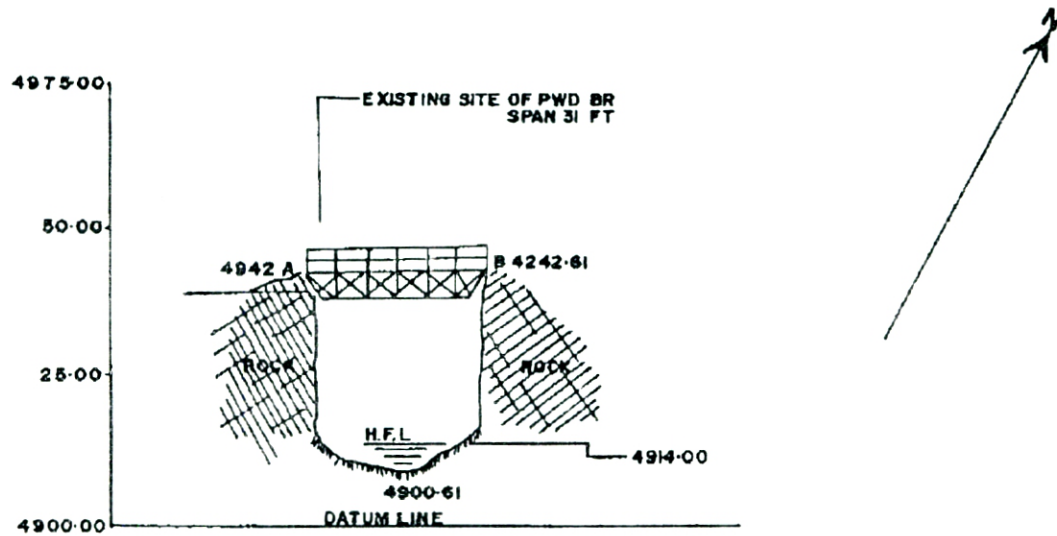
Geologic cross section at the proposed Mile 69 Nullah bridge.
